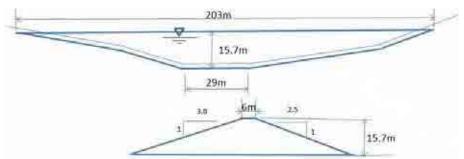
Longitudinal and Cross-sectional Profile of Dam (w/ 10m lifted up)
